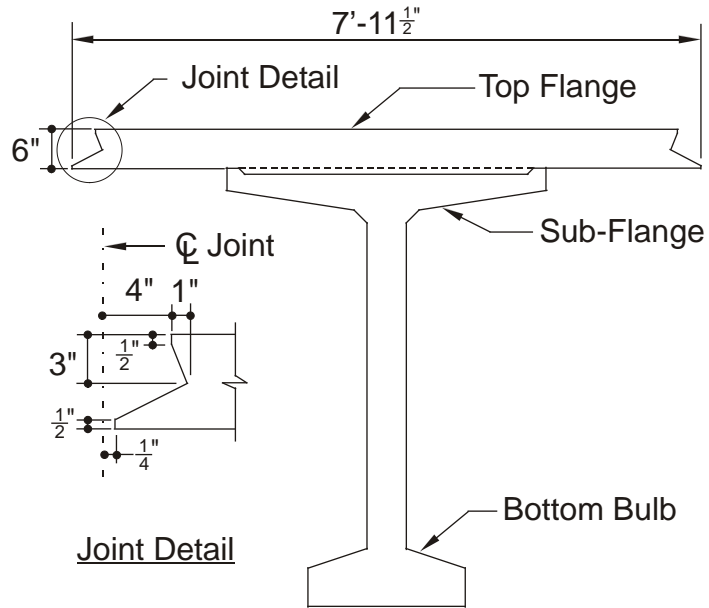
Proposed Girder: Stage 2 of Casting.
